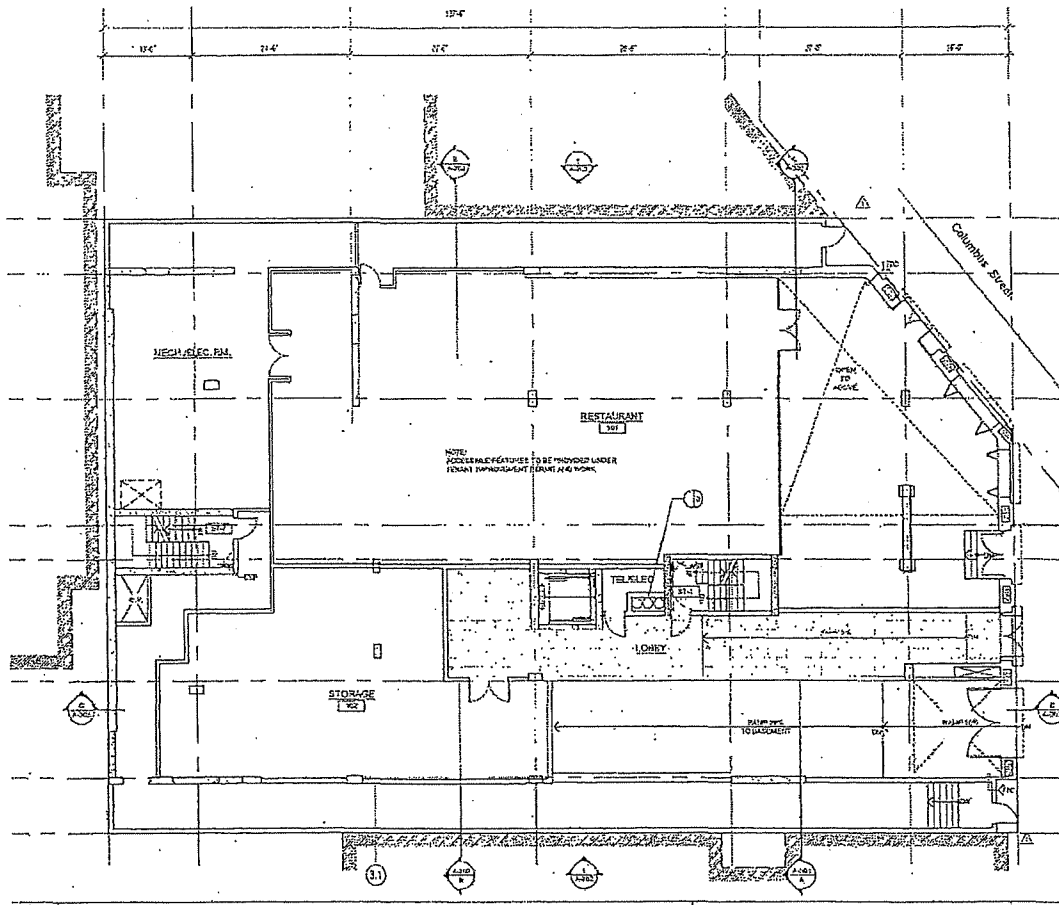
PROPOSED 1731 POWELL ST GROUND FLOOR PLAN
